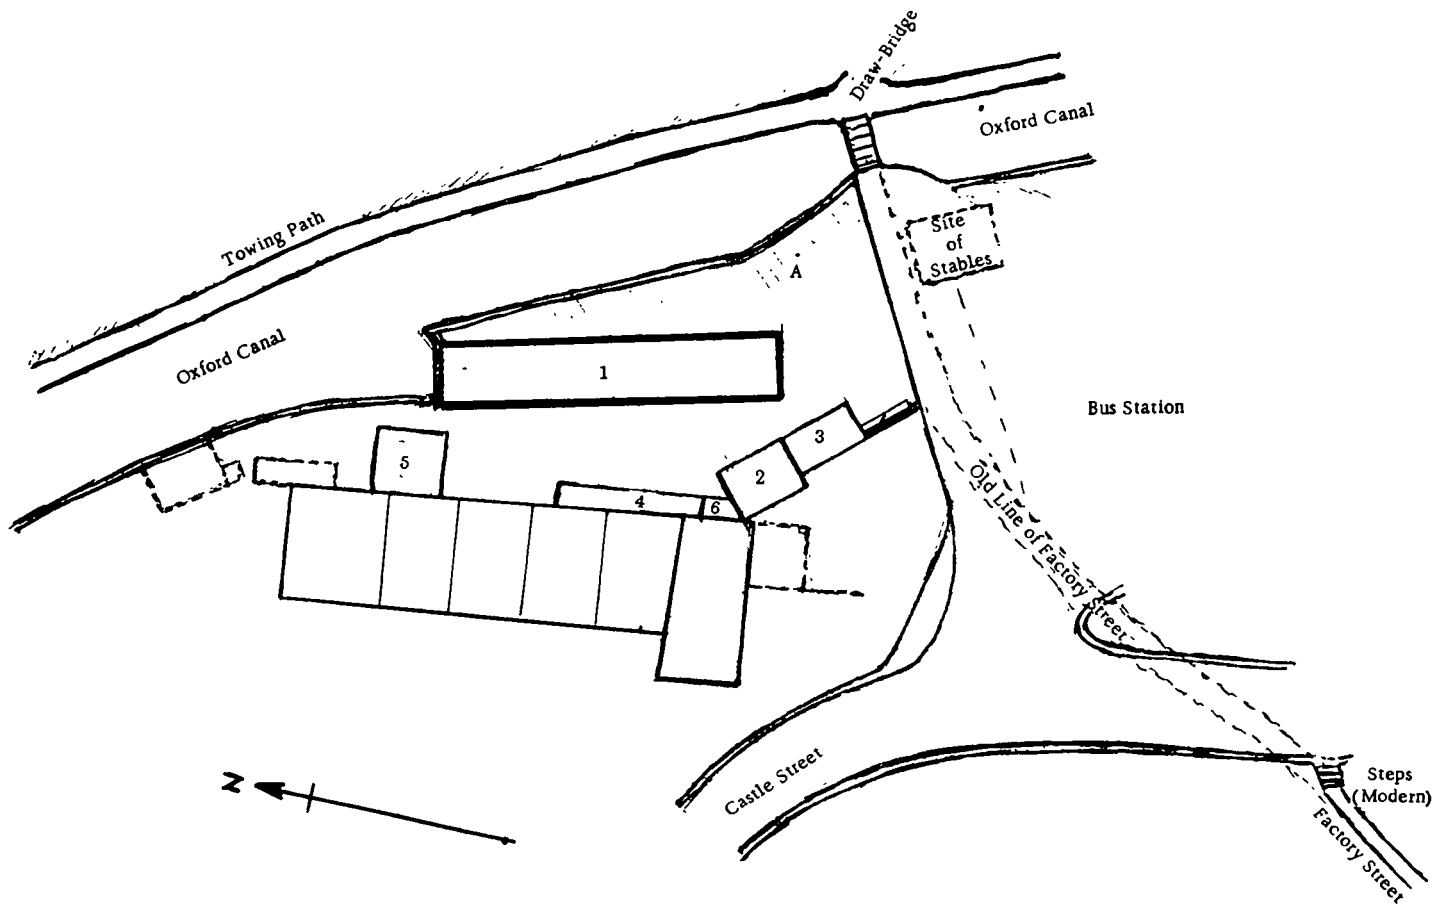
The Boat Building Yard at Banbury - general layout of buildings (ref. O.S. maps, 25 in., 1882, and 1 in. 1964).
